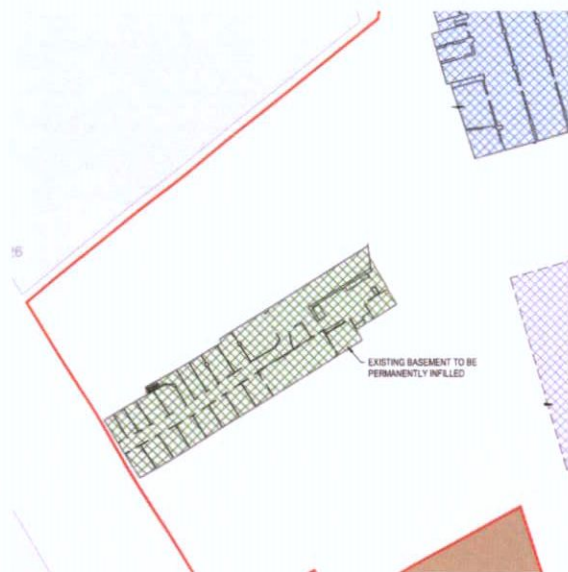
Existing Basements on Site 5 Site (22&23 Moore Street and 13 Moore Lane).
